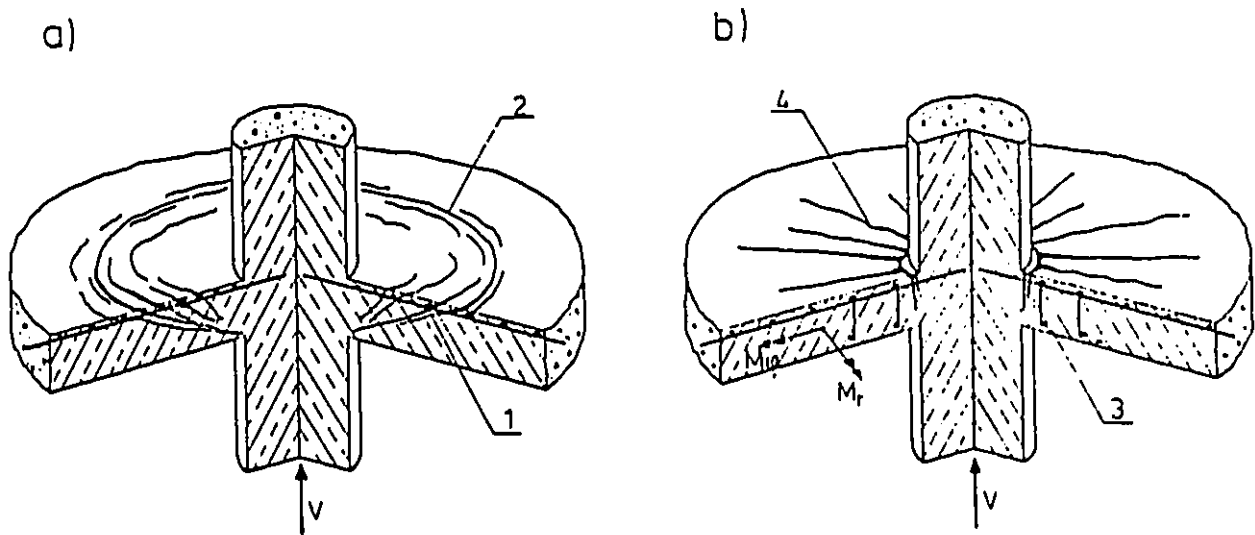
Crack distribution around an internal loaded support a) shear cracks b) flexural cracks 1) inclined cracks 2) peripheral cracks on the top surface 3) peripheral crack around column, arising from M_t , 4) radial cracks (Ajdukiewicz 1990)
